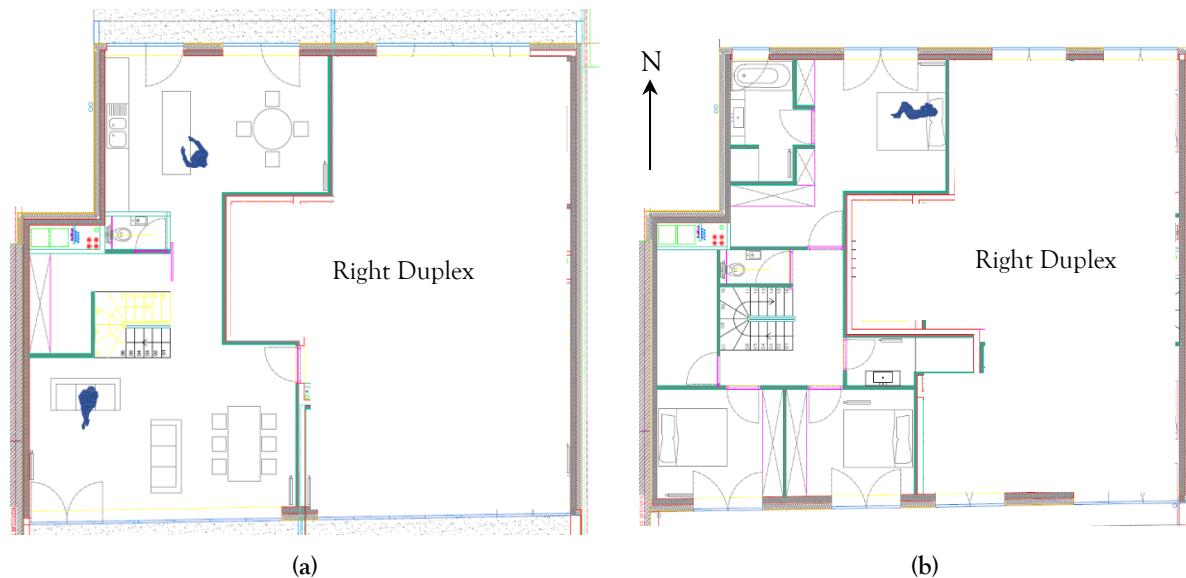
Upper view of the studied duplex (a) first floor (b) second floor
